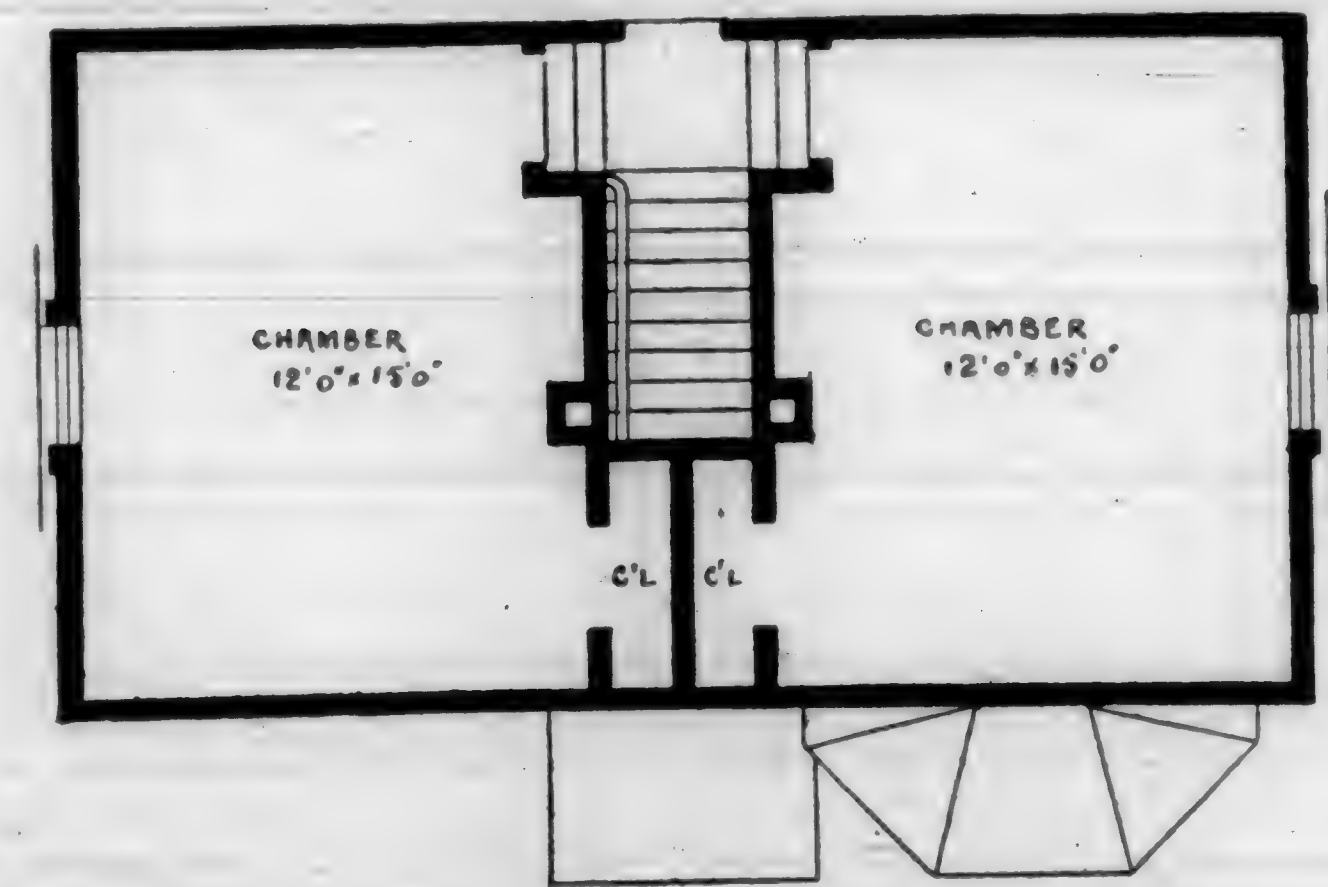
SECOND FLOOR PLAN OF \$1,500 COTTAGE.
